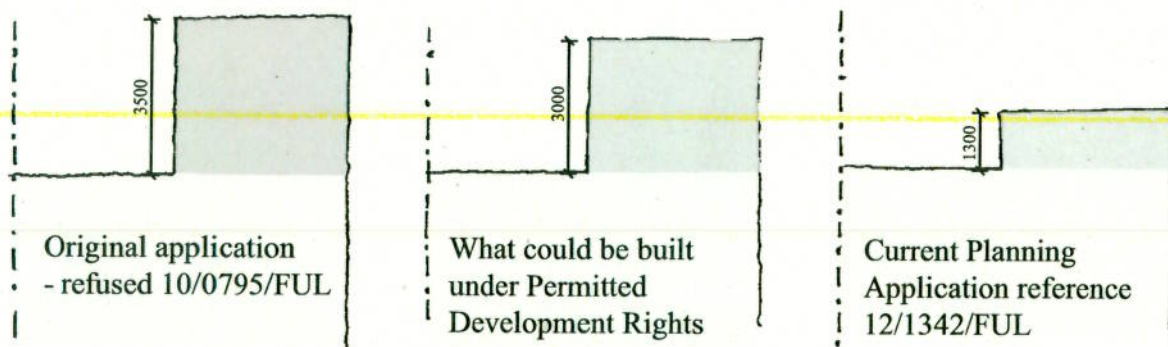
Diagram showing first floor size of previous refused application, what could be built within permitted development rights and what is applied for under this application
